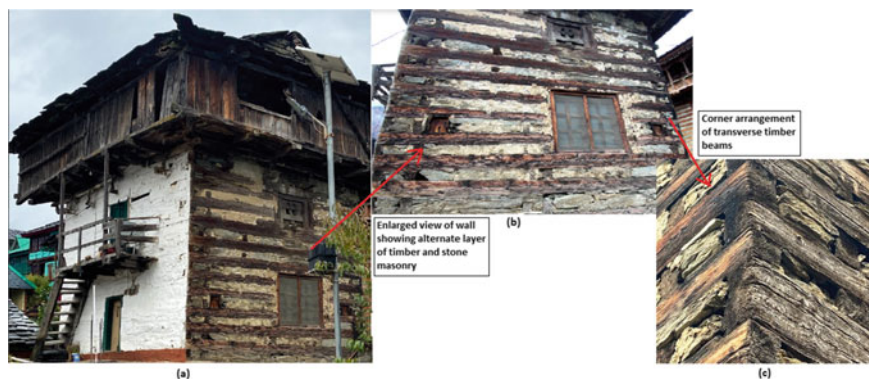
a Kath-kuni tower-like structure. b Enlarged view of Kath-kuni sidewall. c Corner details showing interlocking of transverse timber beams
